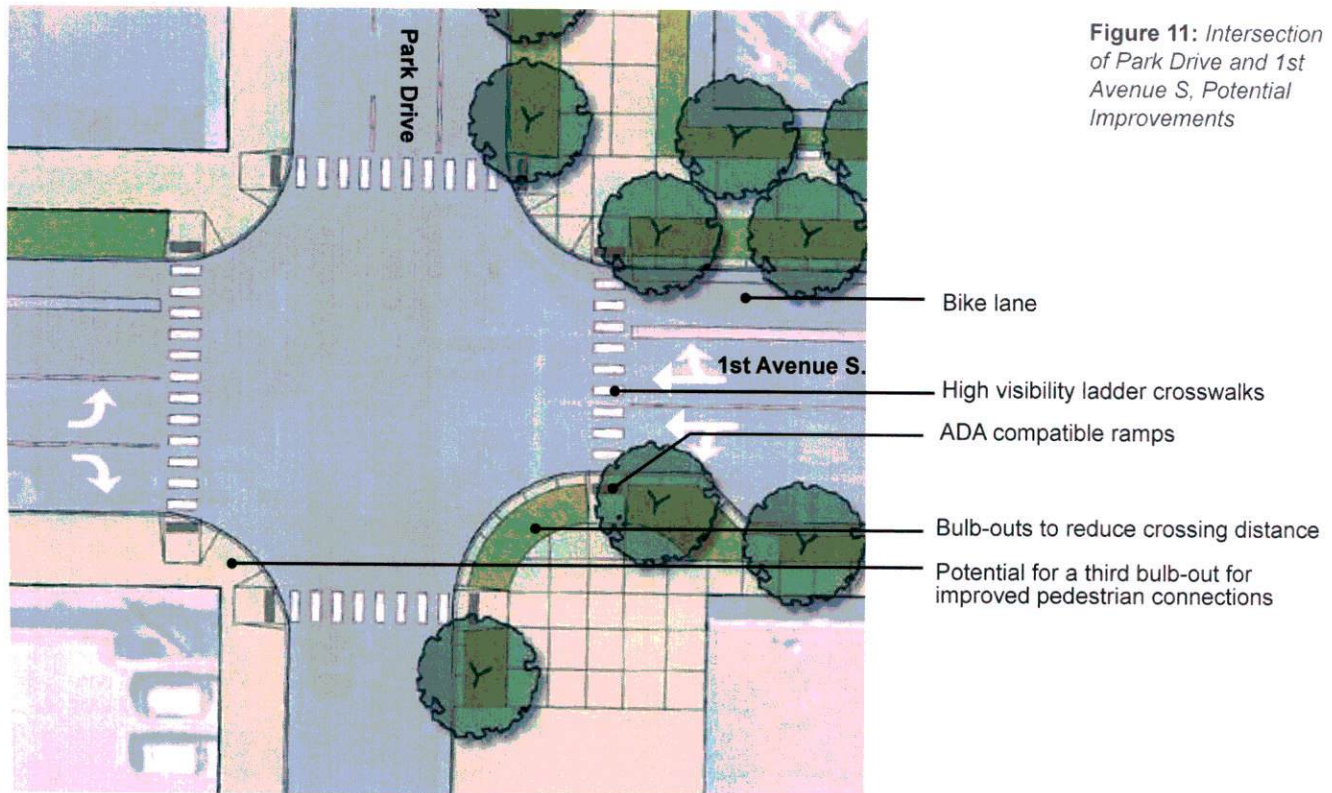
Intersection of Park Drive and 1st Avenue S, Potential Improvements
